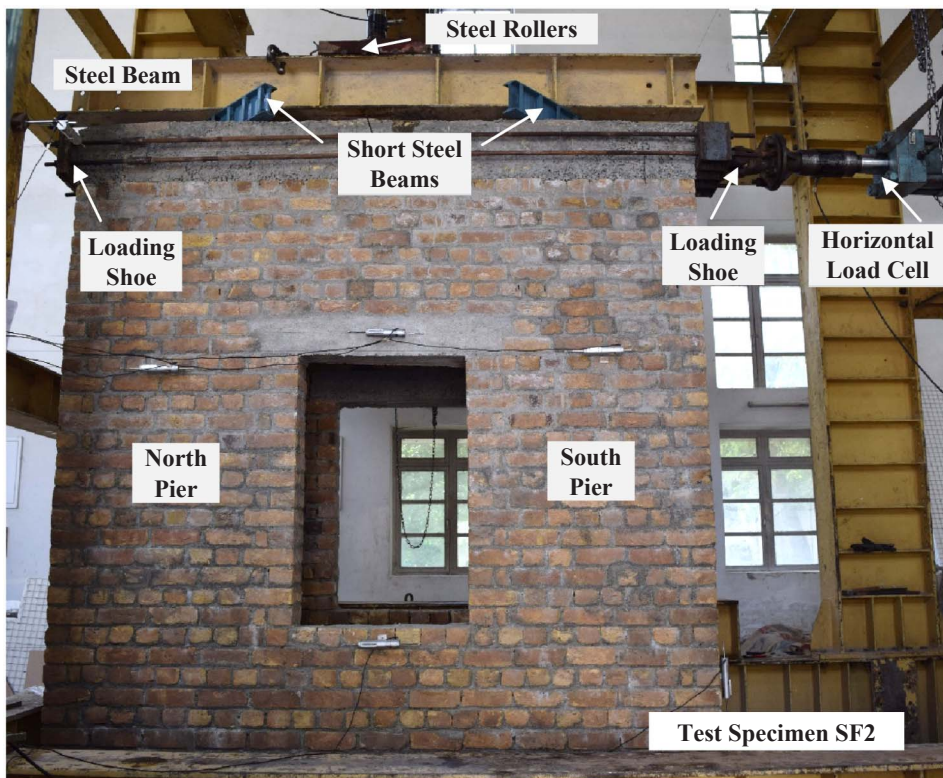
Instrumentation and loading assembly of specimen SF2.
